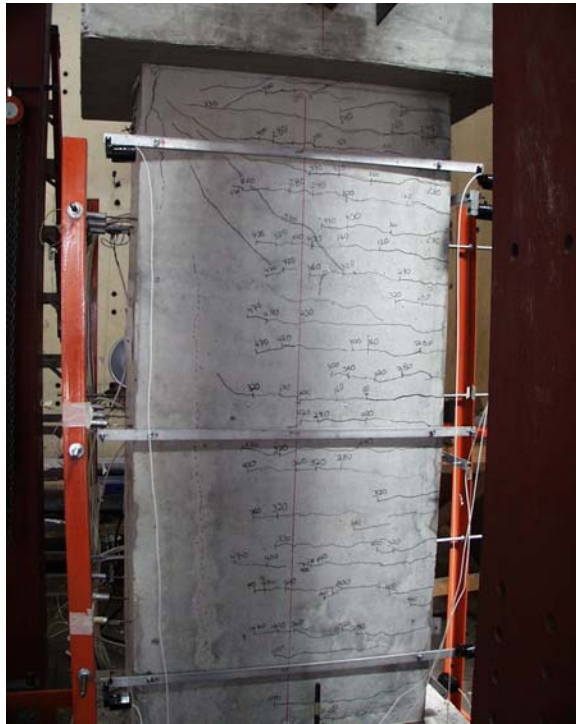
Specimen P10: Photo of West Wall at End of Test
